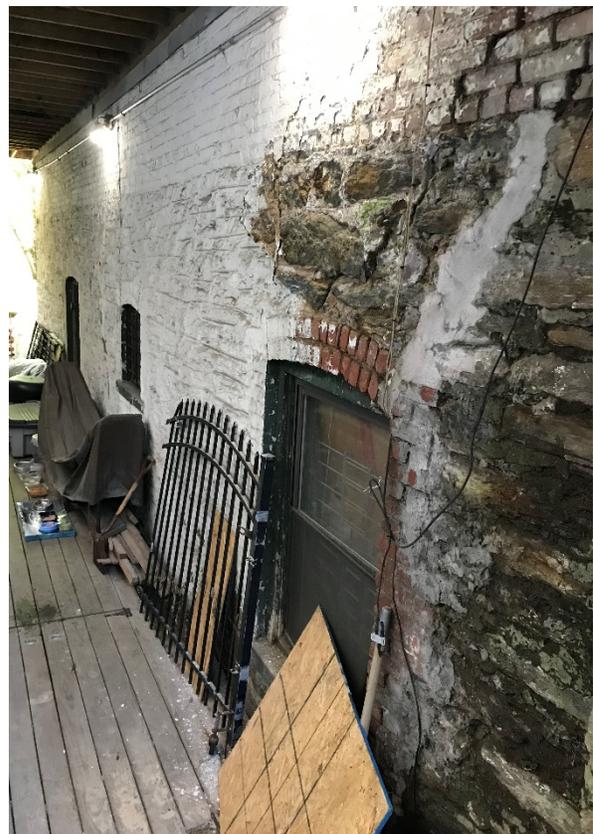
detail of the foundation showing stone and brick coursing and historic windows.
